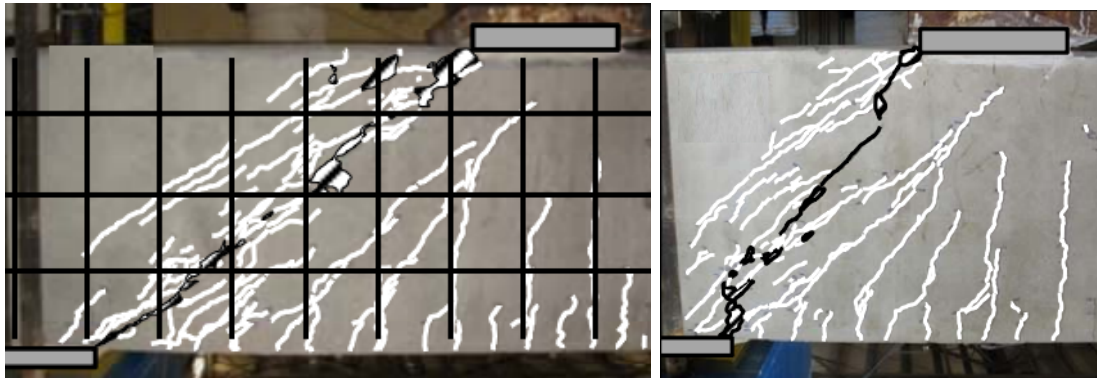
Crack patterns at shear failure in specimens III-1.85-03 (left) and III-1.2-03 (right) [3].
